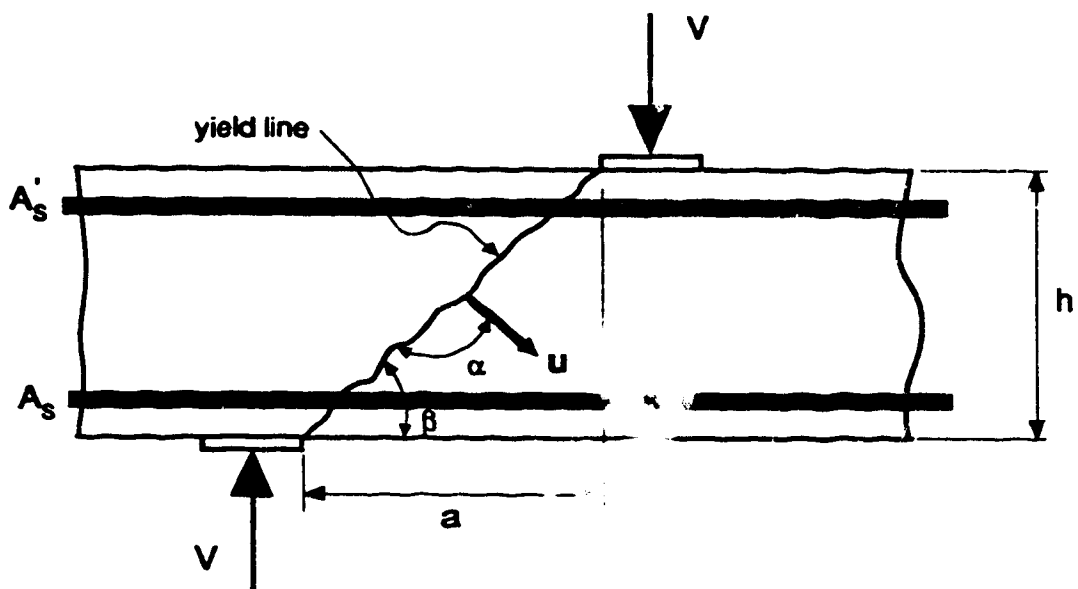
Shear Failure Mechanism for Reinforced Concrete Beam
